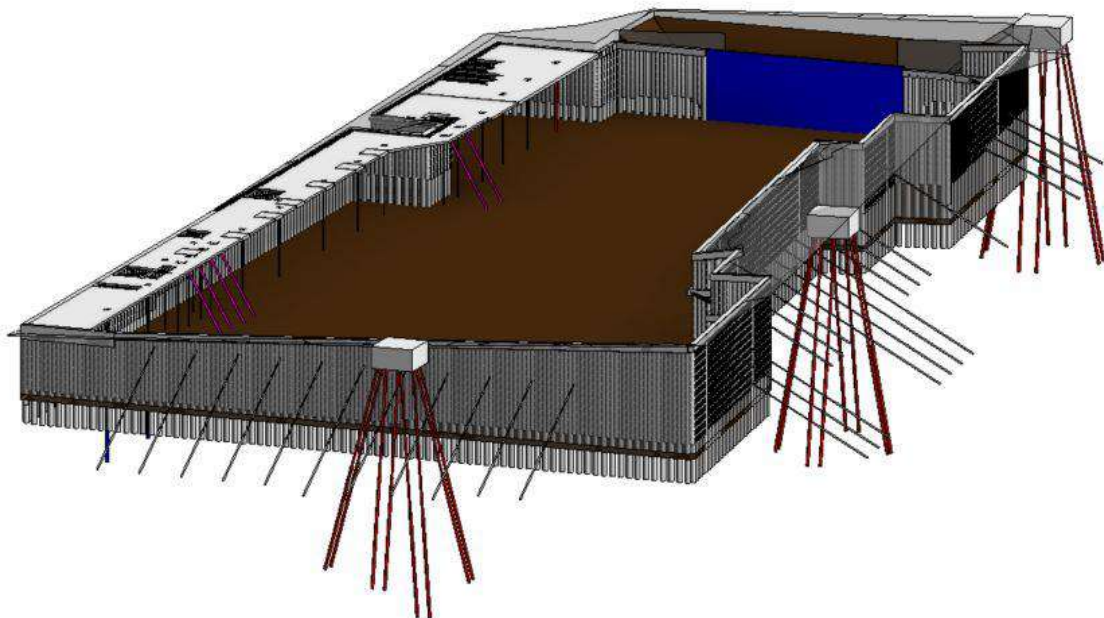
3D model of the earth retaining solution with the tower crane foundations.
